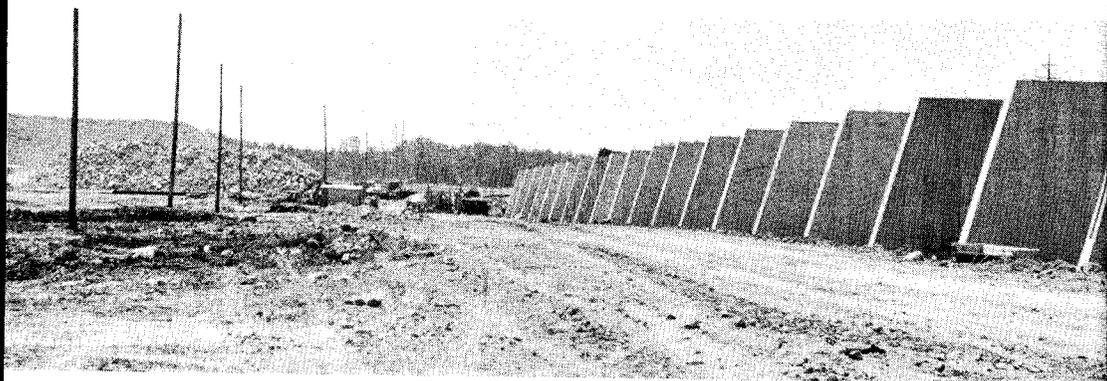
Quarried rock will be stored in bunkers to be erected in these foundations at the Charlevoix site.
